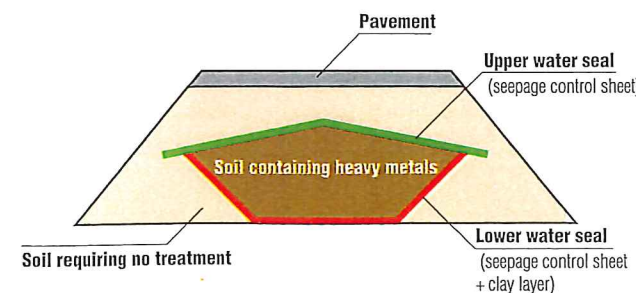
Structure of an embankment to deal with soil containing heavy metals
